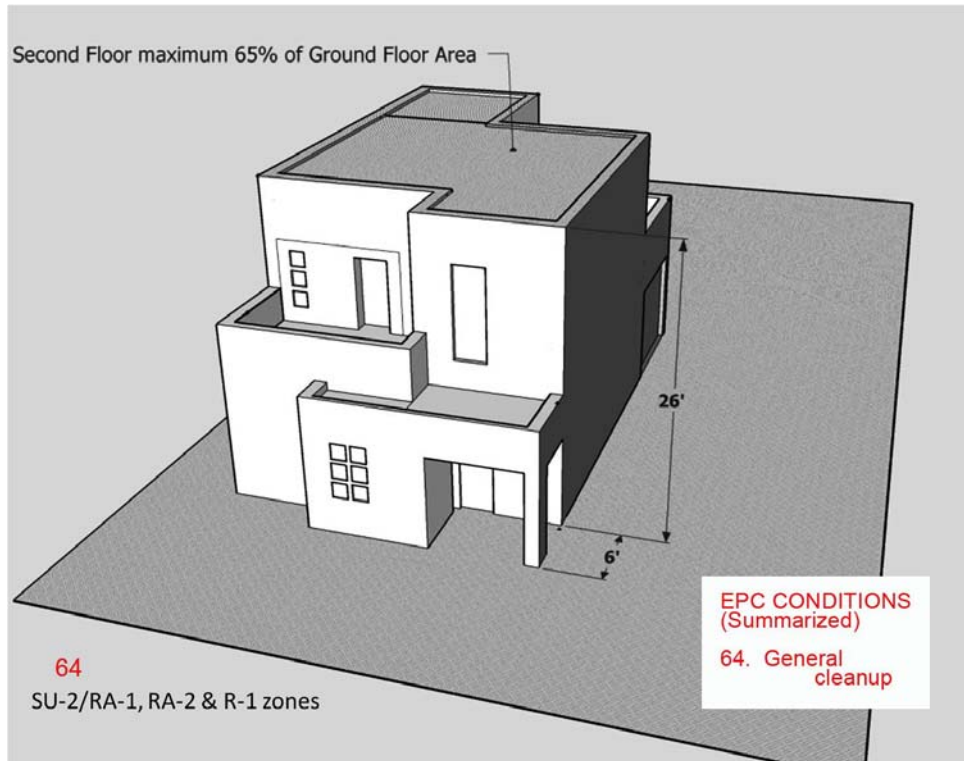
Figure X Example Flat Roof House: showing height standards and second floor area maximum.
